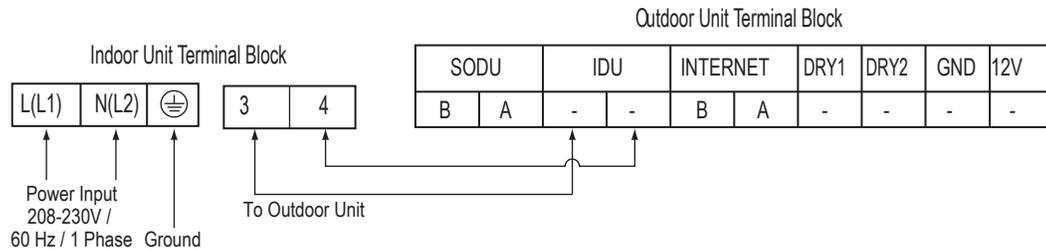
Simplified View of Indoor Unit Terminal Connections—SJ and SK Frames.
